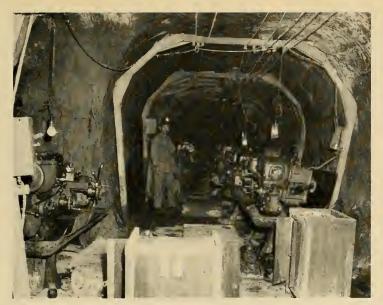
Tunnels in sand mines near Tsu City, Handa plant.
